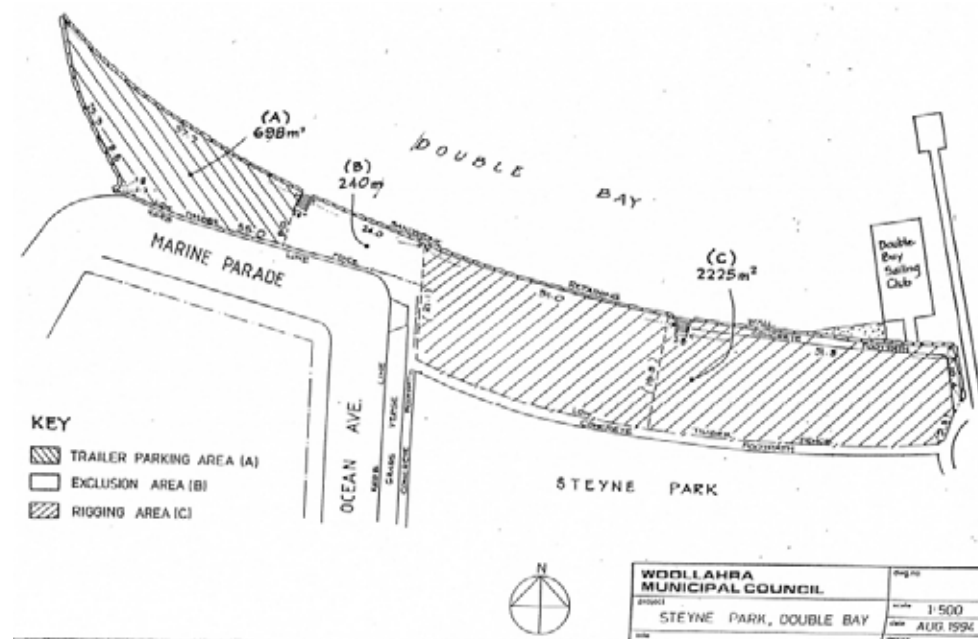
Plan displaying area in m<sup>2</sup> for rigging and trailer parking, Steyne Park.
